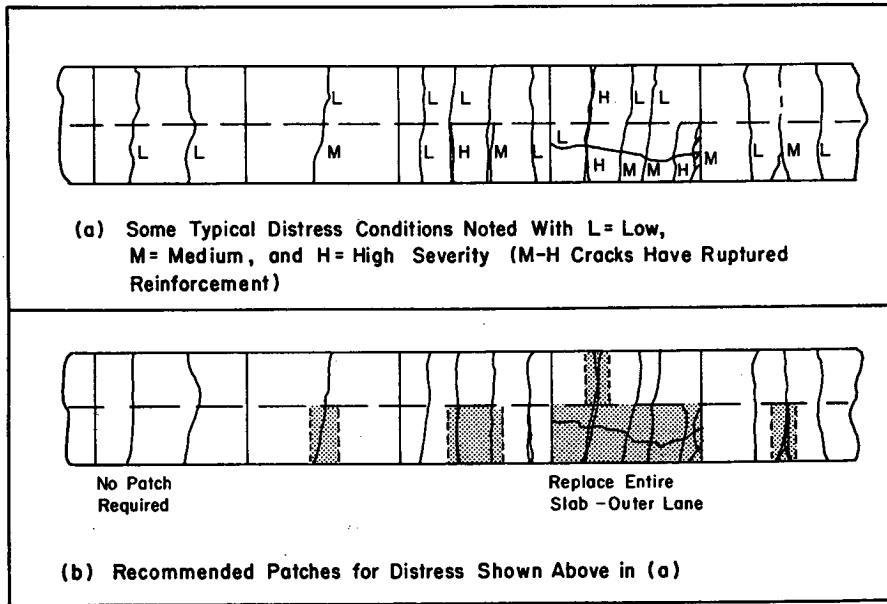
Illustrations of patching recommendations for reinforced concrete pavements (see Fig. I-3 for load transfer).
